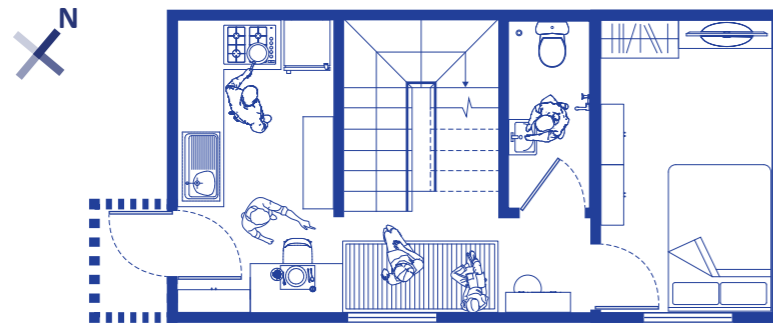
Grandparent's house new floor plan after urban redevelopment (First Floor Plan)
